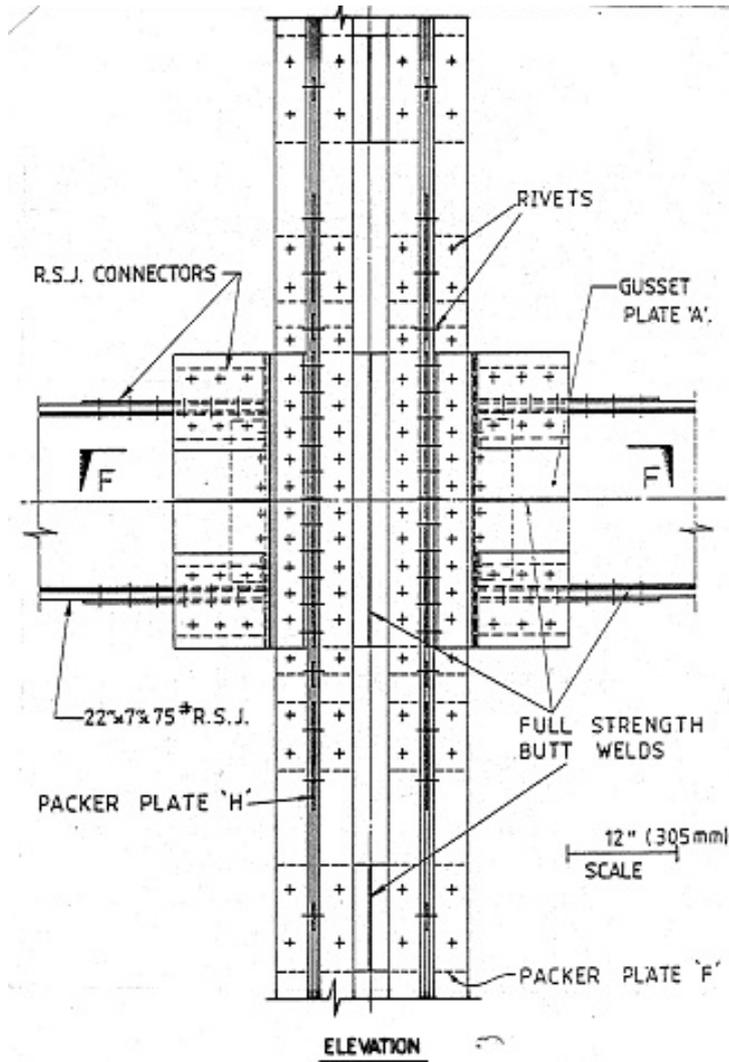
A.1: Riveted steel fabrication details, Government Life Insurance Building, 1937 (Wood, 1987)
